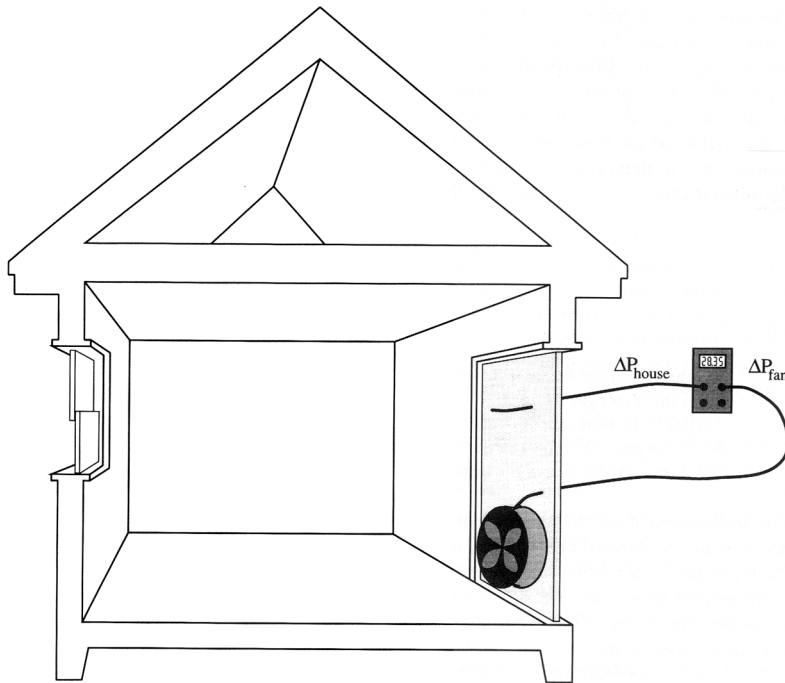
Sketch of a typical blower door test setup.
